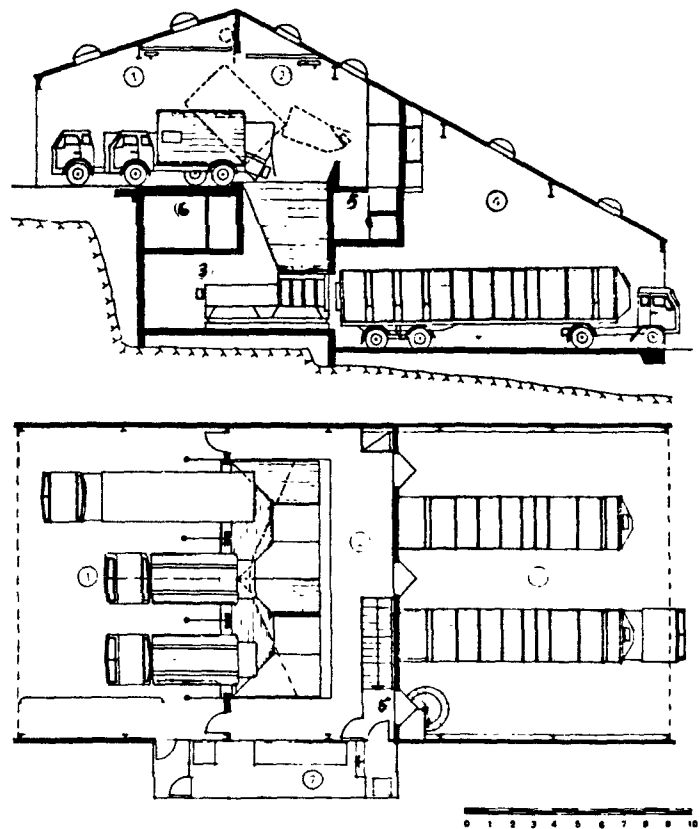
CROSS SECTION AND PLAN VIEW OF TRANSFER STATION.
